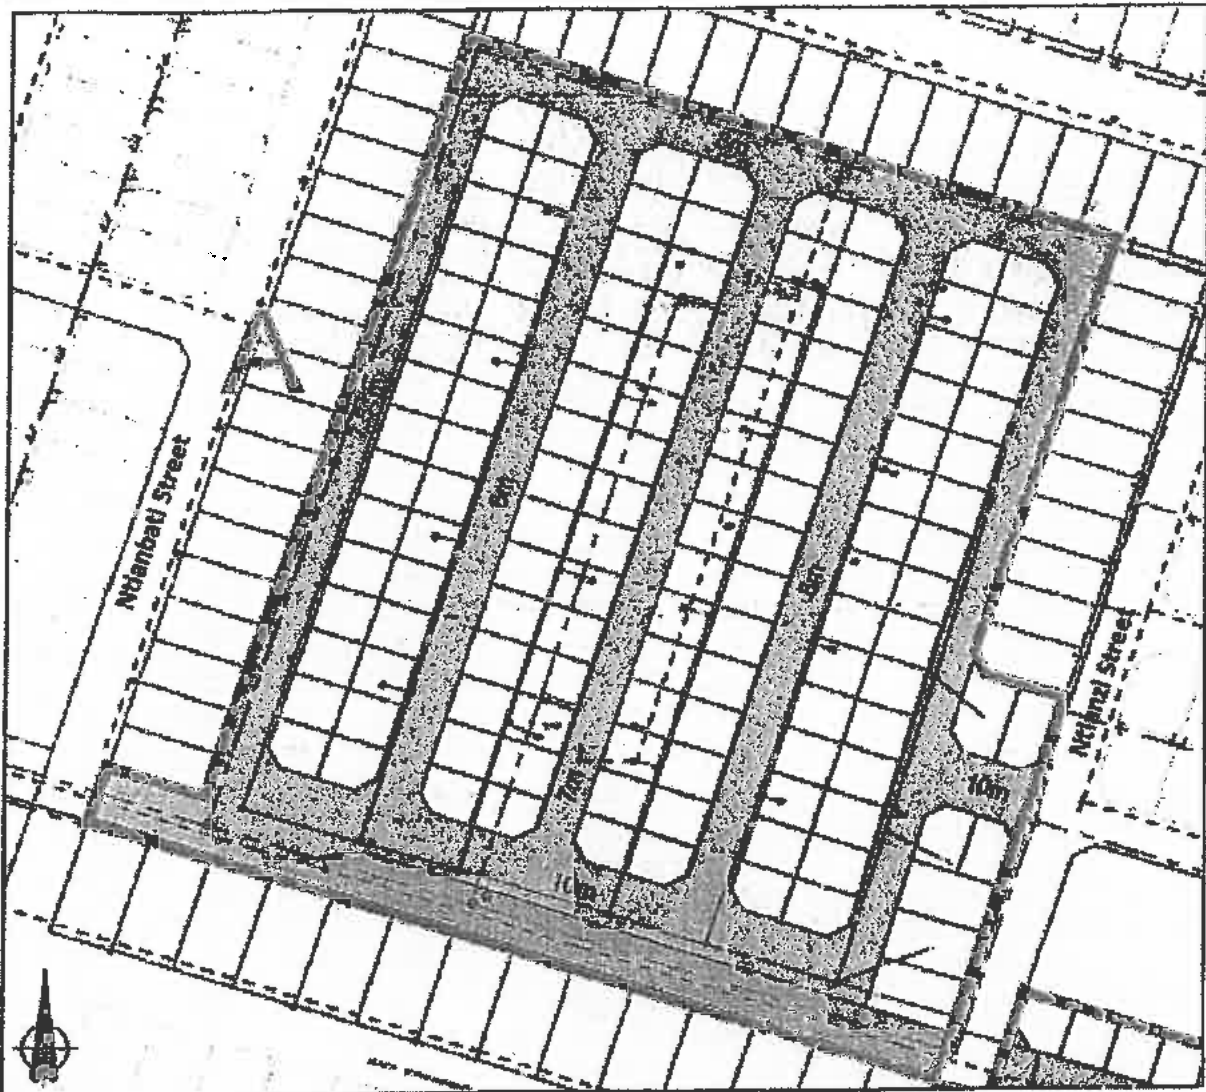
LAYOUT PLAN – APPLICATION AREA A: TRANSIT CAMP
